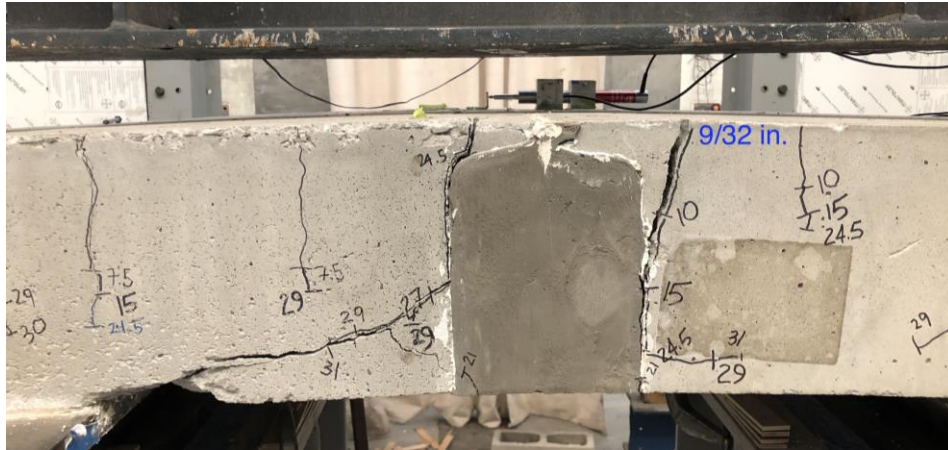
Photo. Horizontal cracking at 30 kips.
